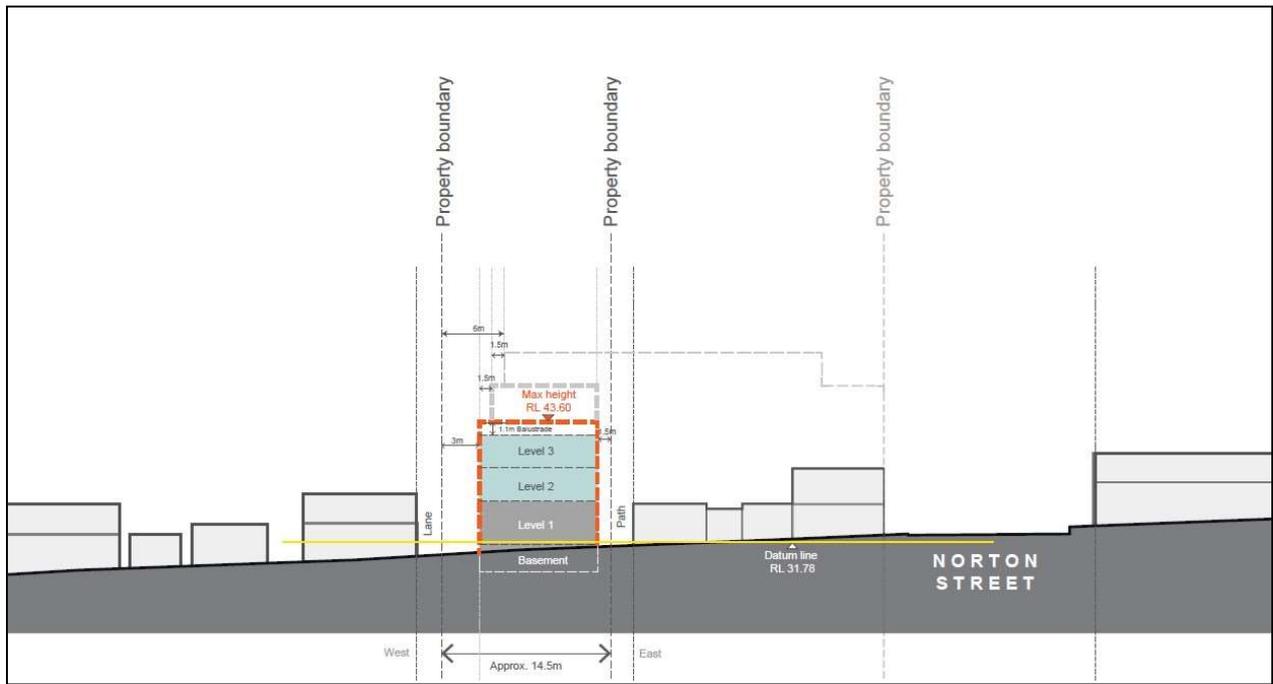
Building heights and Massing envelope - Section C (Carlisle Street elevation)
